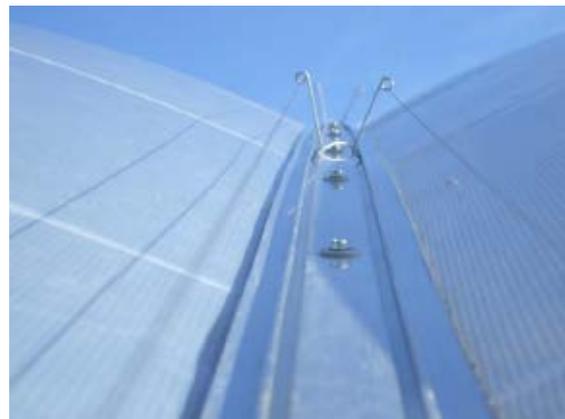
Aluminium extrusion used for securing edges of ETFE cushions
